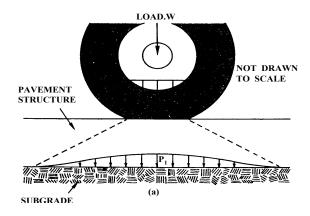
Spread of Wheel-Load through Pavement Structure
